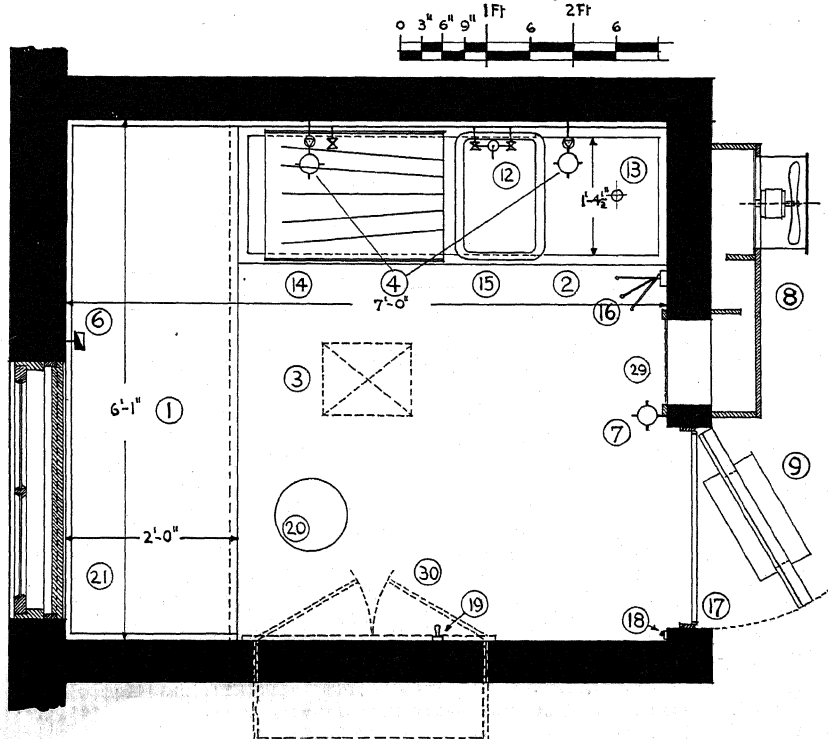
Plan of Lee Parsons Davis' model darkroom.
